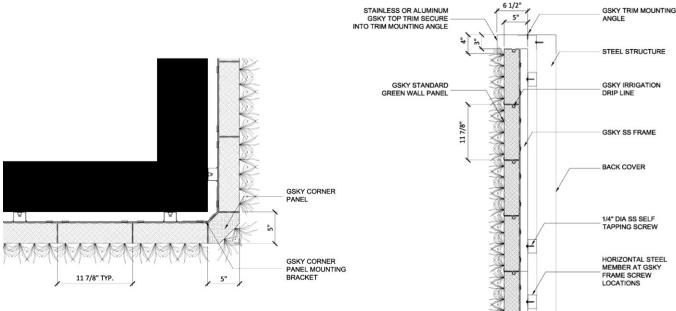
Soil modules plan and section details (<u>www.gsky.com</u>)
